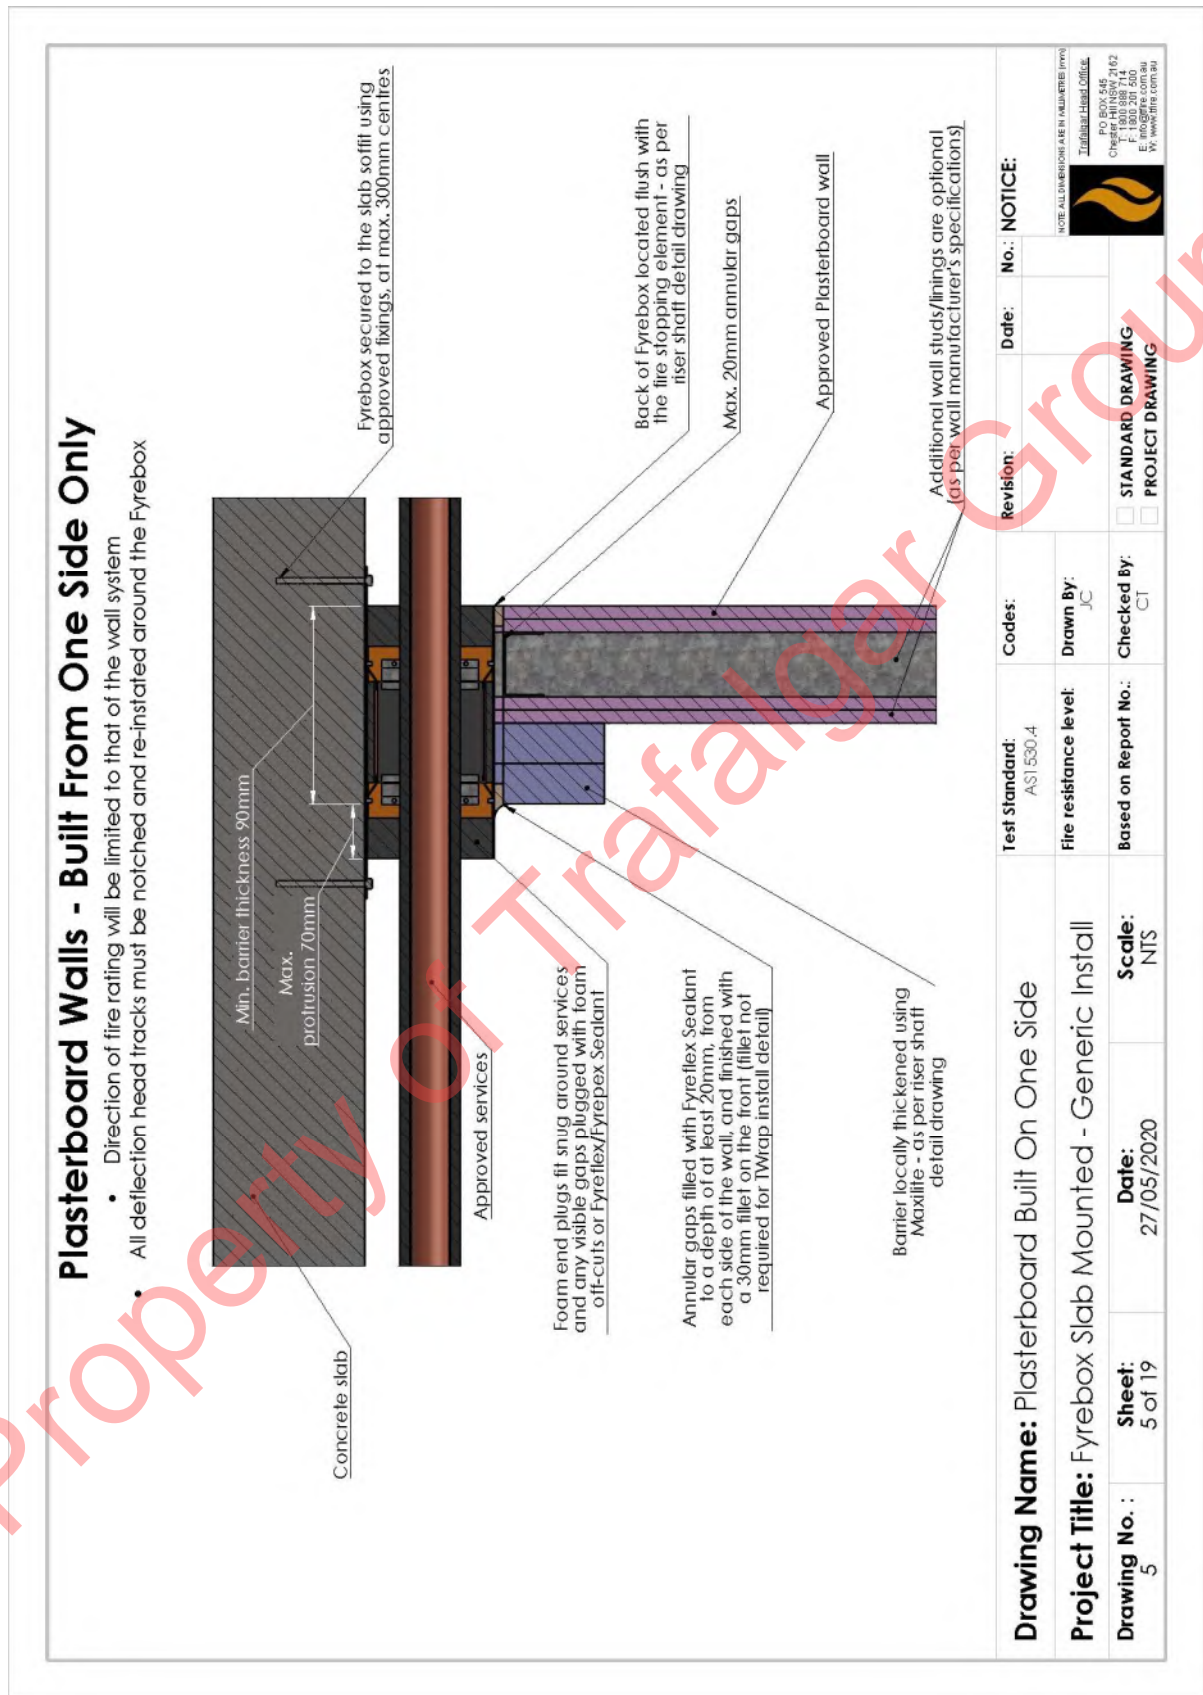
FyreBOX Slab Mount – With plasterboard walls Part 2
